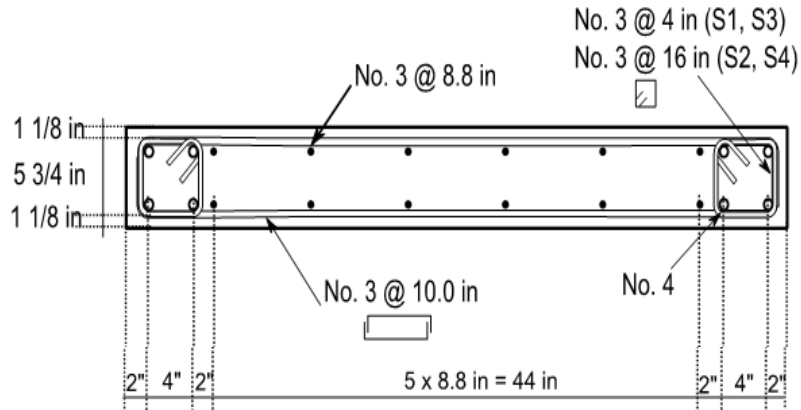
Cross-Sectional Dimensions and Reinforcement Details of Wall Specimen
